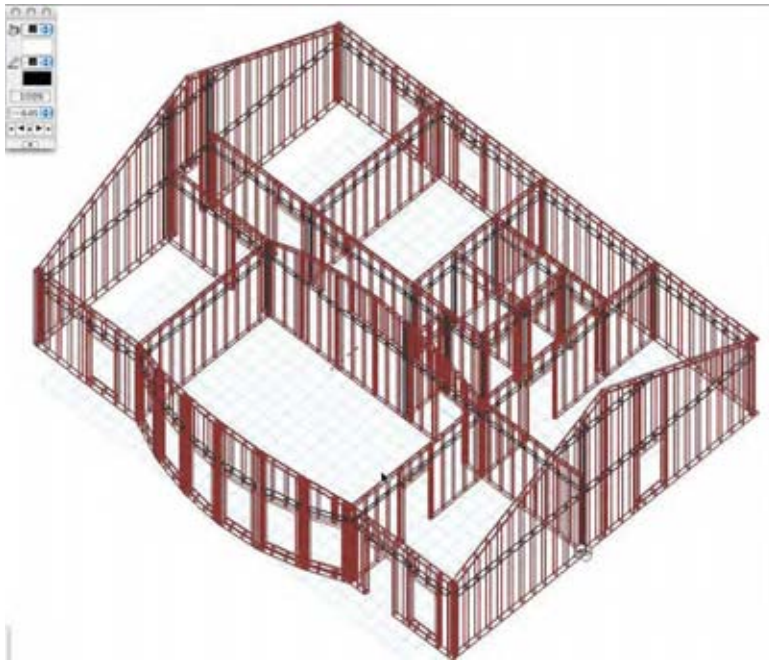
Automated wall framing based on rules such as plate material lengths, blocking style, opening framing style, etc.
